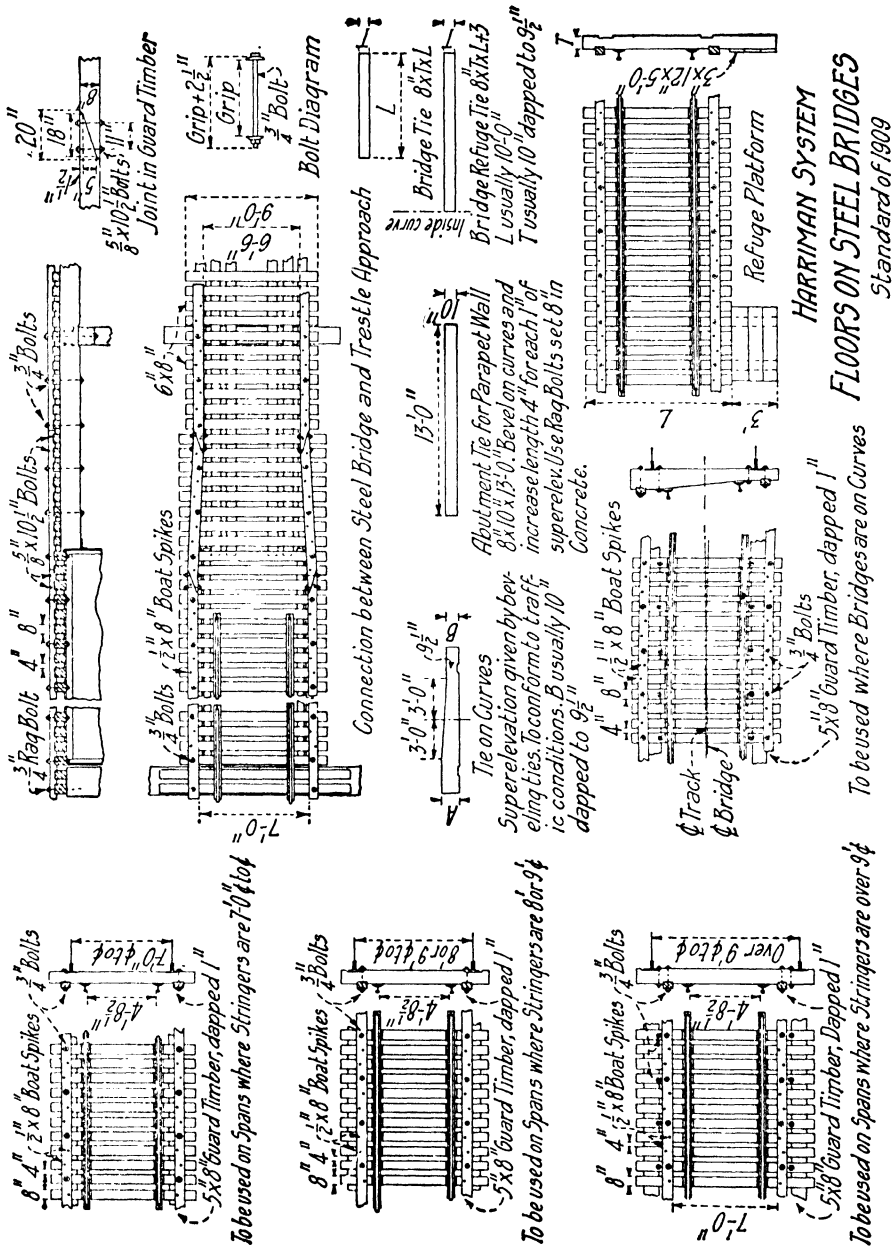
TIMBER FLOORS FOR RAILWAY BRIDGES.
